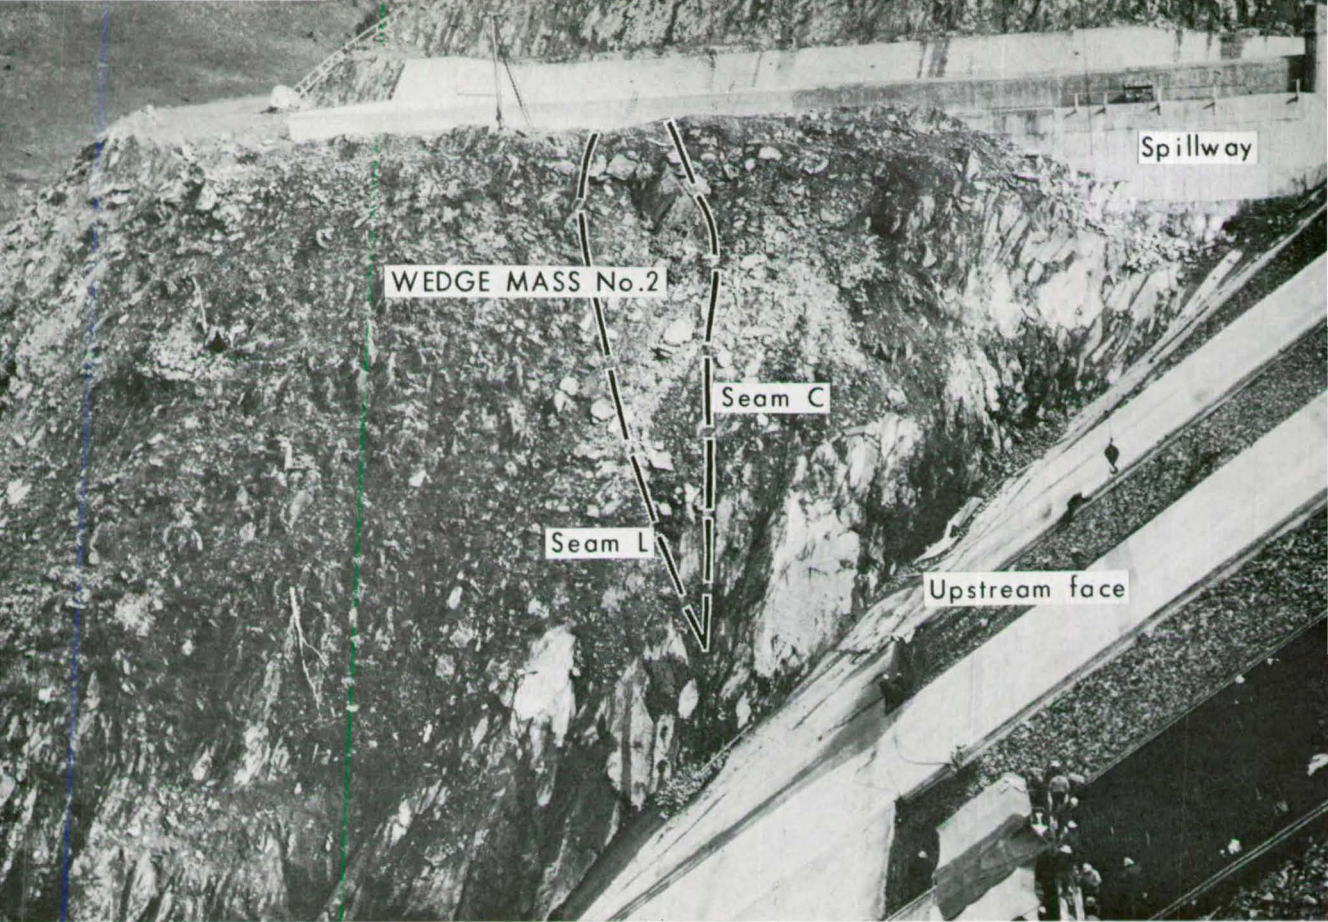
View of left bank upstream of dam embankment. Wedge mass No. 2 is located between spillway block LB and grout cap, block C.
